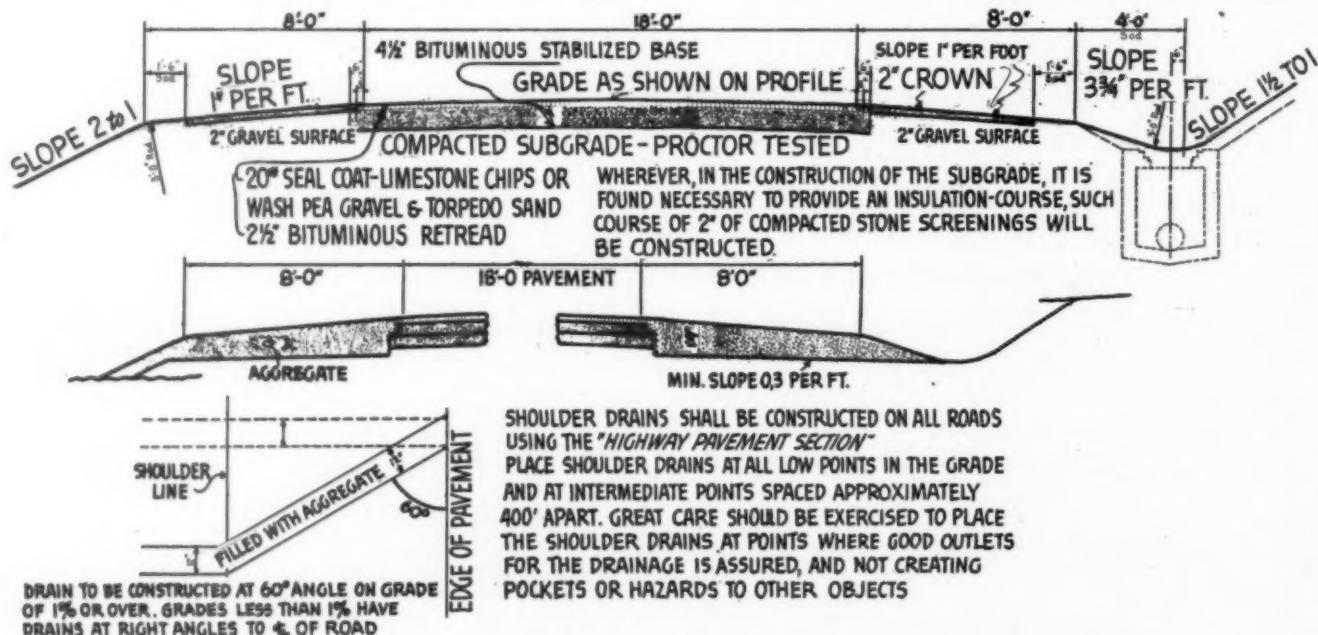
Proving Grounds Recovery Road Cross-Sections. It is a 2½-In. Bituminous Retread on a 9-In. Bituminous Stabilized Base. French Shoulder Drains Constructed As Shown
